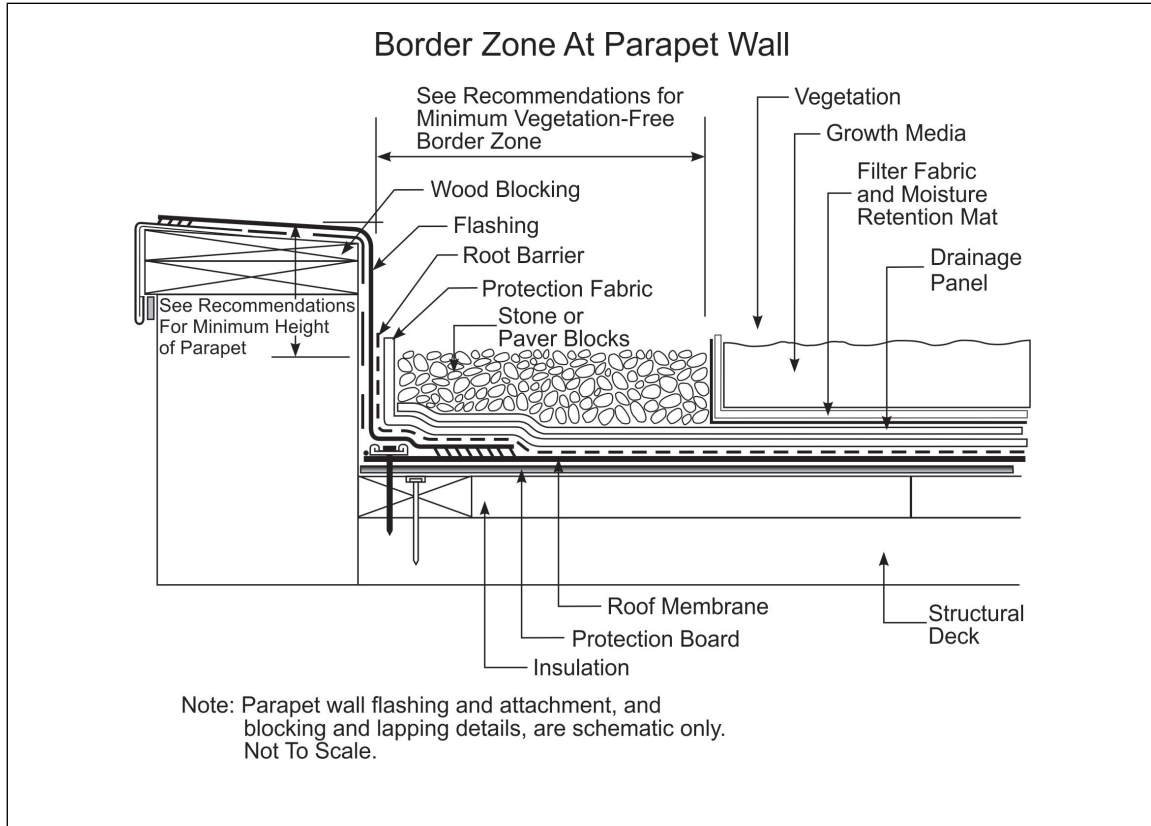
Example of non-vegetated border zone detail at parapet wall
